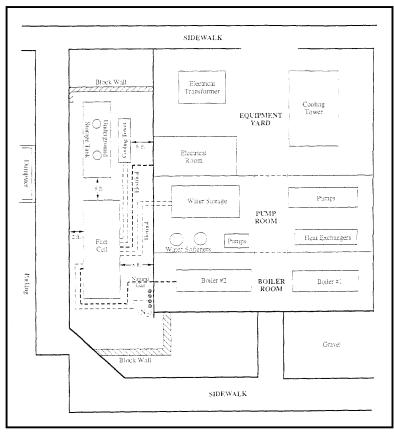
Central plant layout and fuel cell location, Nellis AFB, Bldg. 791.
